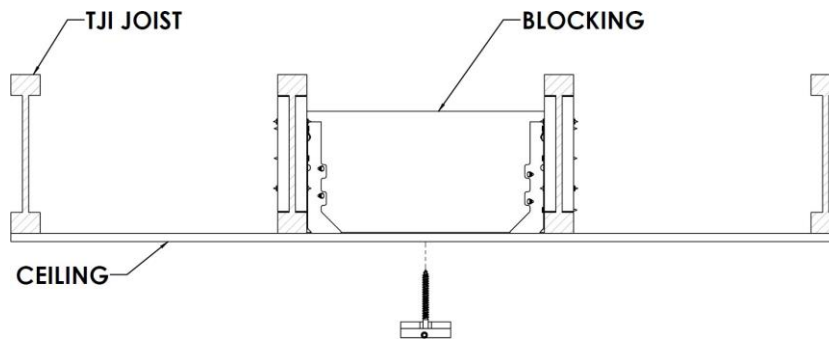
Structural Wood Screw or Lag Bolt in the Center of the Wood Blocking
